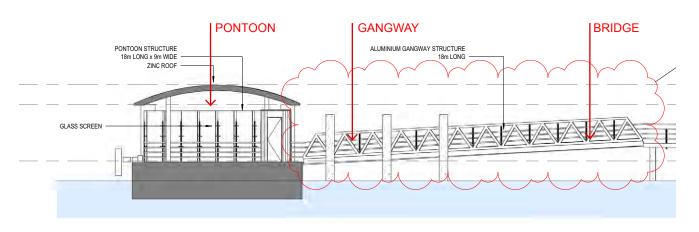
Architectural elevations of proposed wharf structure (Conrad Gargett, 2018)
